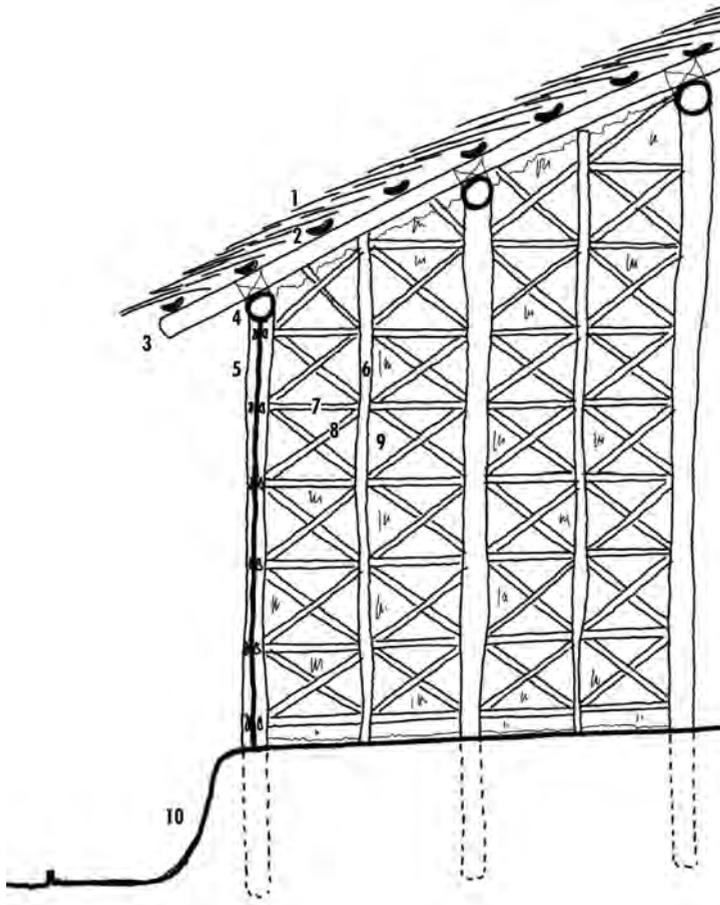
Detail section of a vernacular building with a thatched roof (1) on bamboo battens (2) supported by bamboo rafters (3) and purlins (4). The walls consist of a primary structure of bamboo columns (5), a secondary structure of half-cut bamboo (6) and a tertiary structure of horizontal bamboo slits (7). In more elaborate cases the horizontal layer is complemented with a layer of diagonal slits (8). The horizontal and diagonal slits provide a base for a wall filling with grass, leaves or unrolled bamboo (9). The structure is raised from the ground through an earth base (10).
